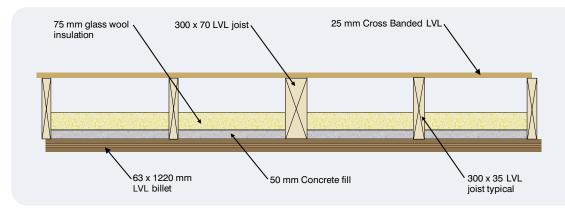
Section through LVL double skin cassette with concrete and insulation.
